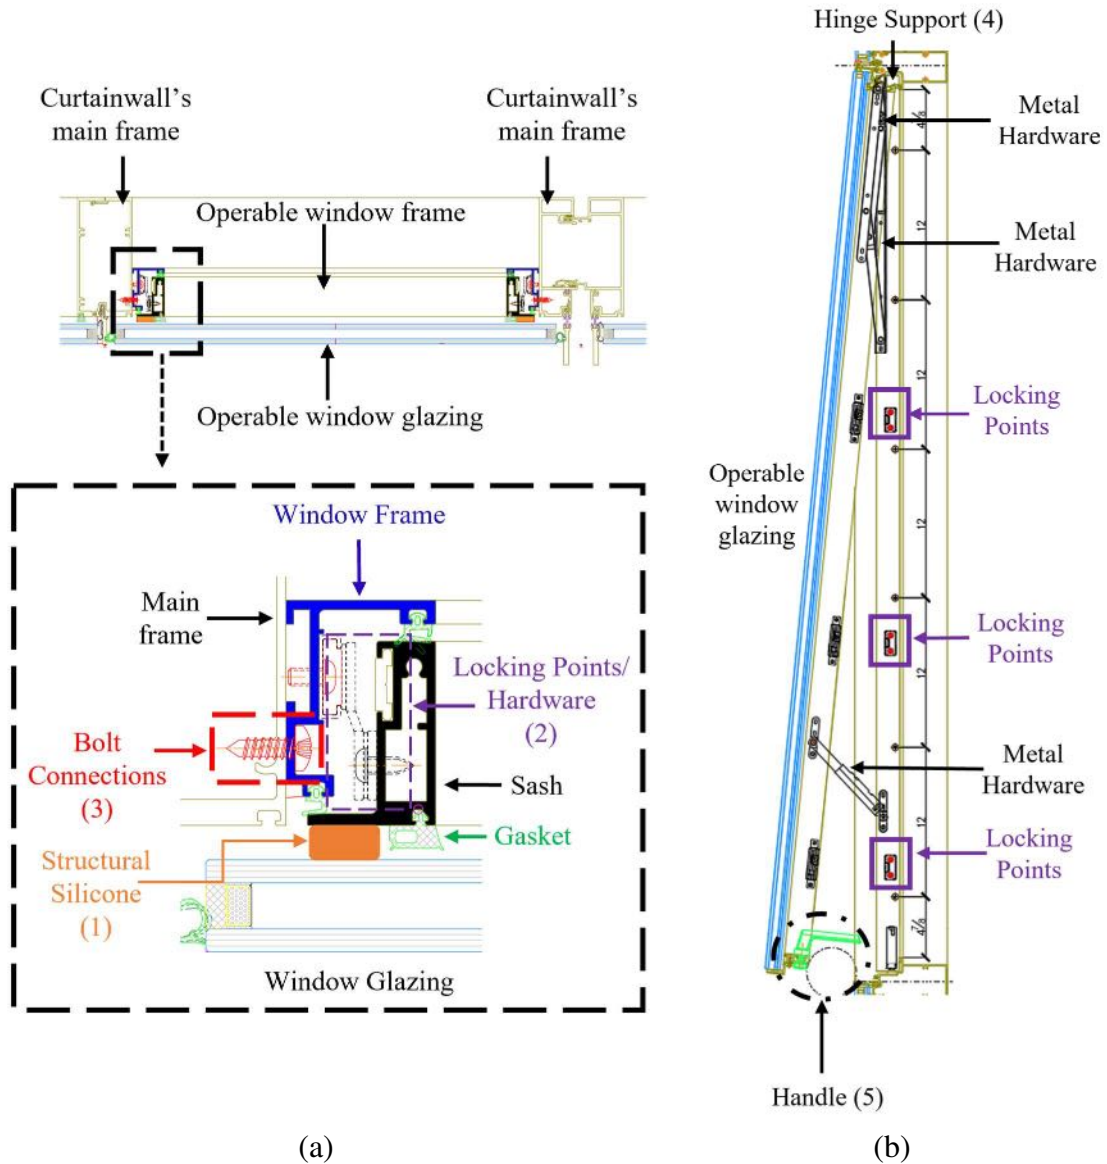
Anatomy of the operable window system, connections between the window frame, sash frame, and the curtainwall: (a) horizontal cross-section, and (b) vertical cross-section.
